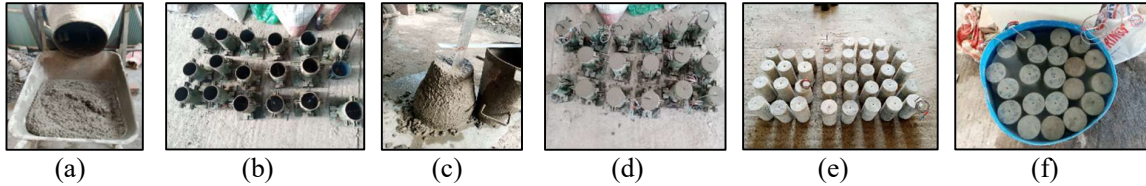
Construction of Concrete Samples: (a) Mechanical Concrete Mixing, (b) Preparing Moulds, (c) Slump Test, (d) Casting of Concrete in Concrete Moulds, (e) Demoulding, (f) Curing
